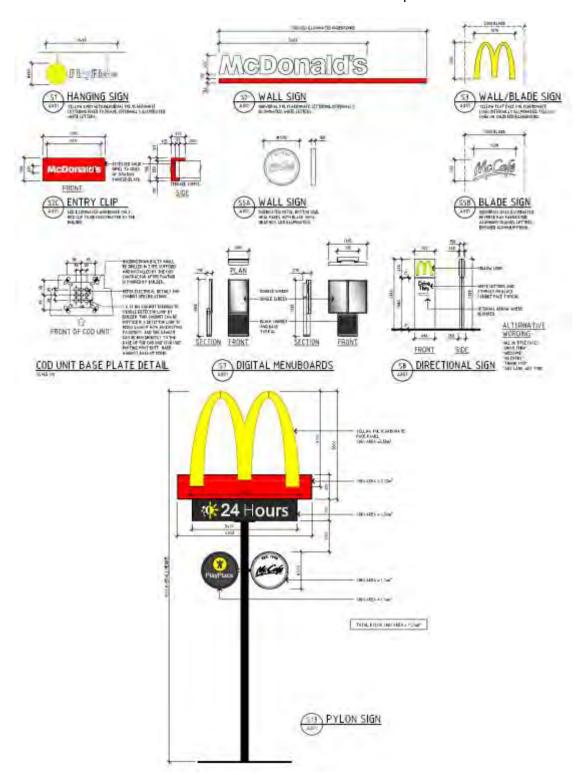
Proposed Building/Business Identification Signage (Source: Richmond and Ross)
